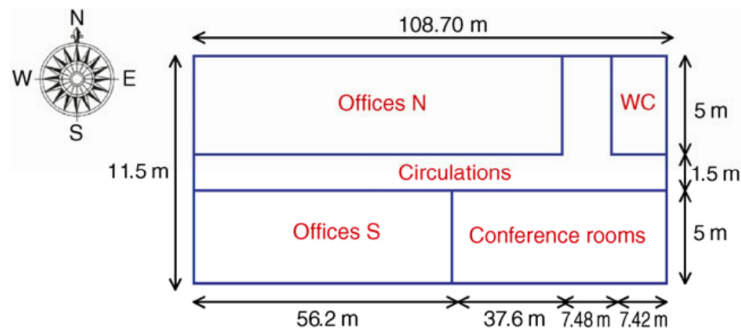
Office building floor geometry (Stabat *et al.*, 2011)
